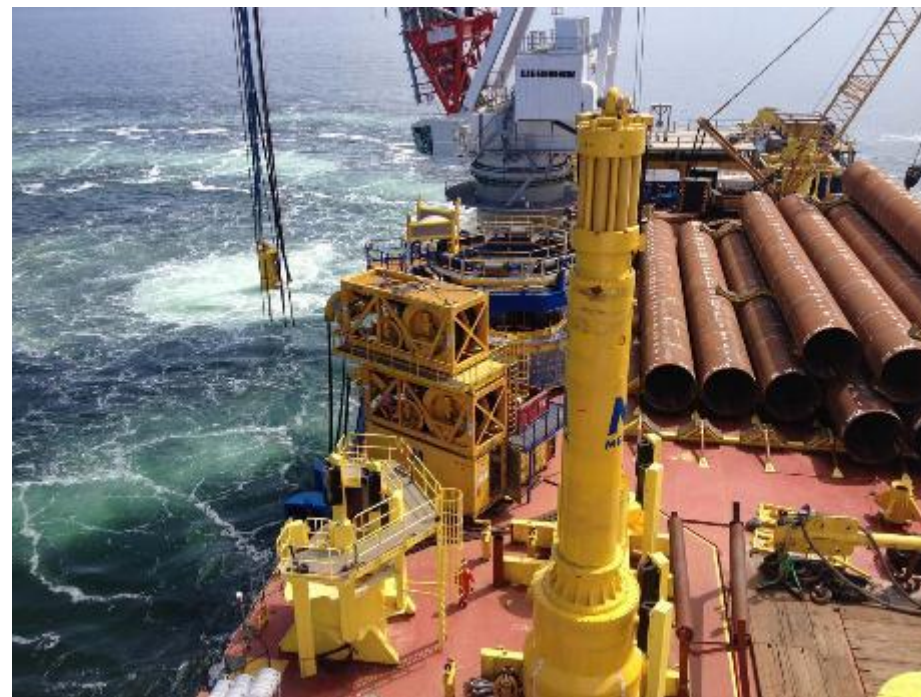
Jacket foundation pin piling operations, courtesy of Menck.
